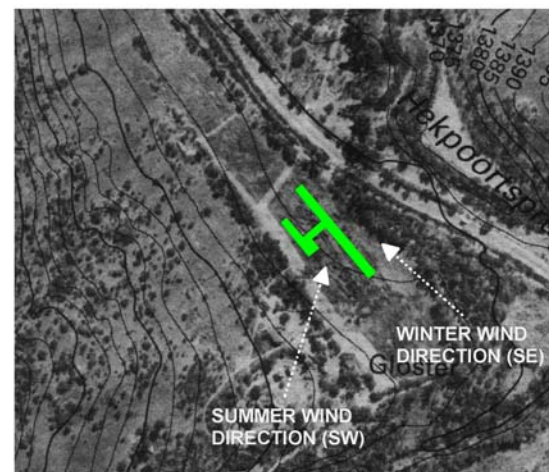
Site layout plan indicating general wind direction during Summer and Winter.
